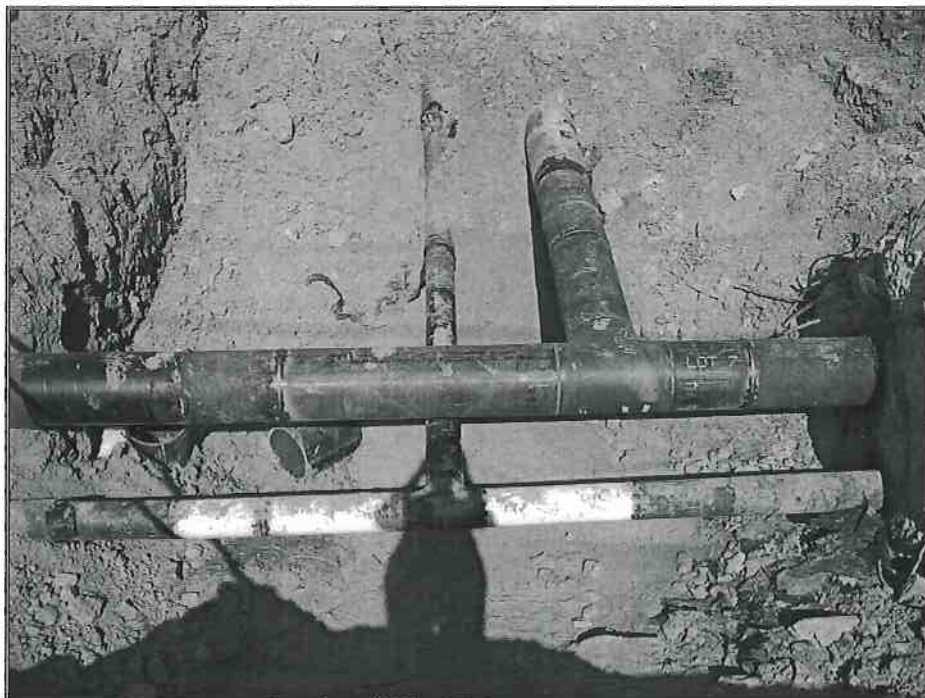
A – Valve Pit 9A Valve Removal JP-5 Pipeline
